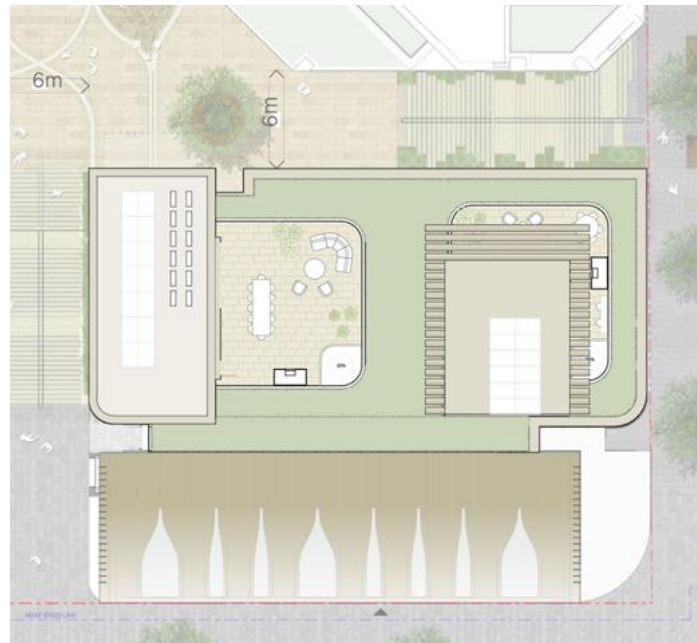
General Arrangement Plan – Level 18 – William Street East Building
